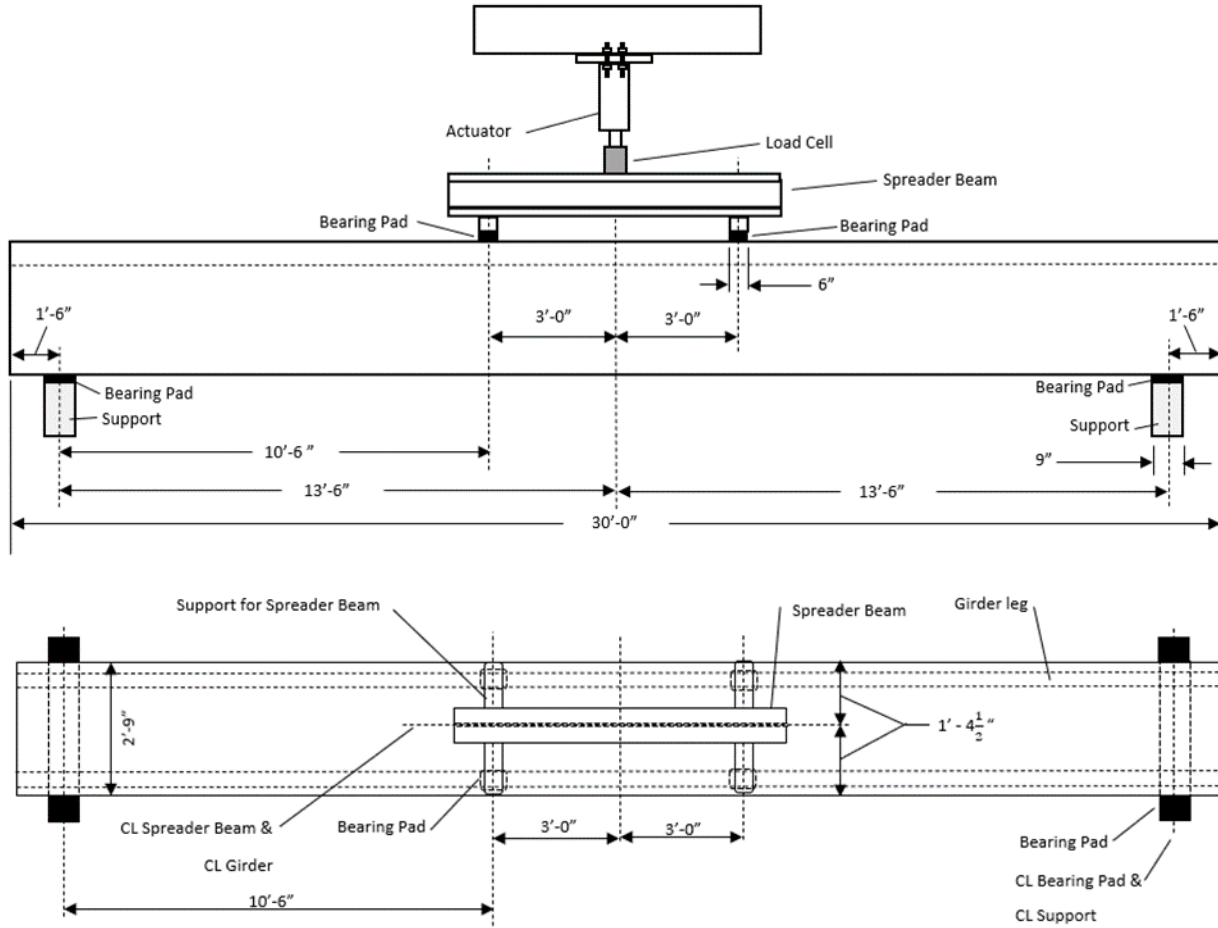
Elevation (top) and plan view (bottom) of channel test setup.
